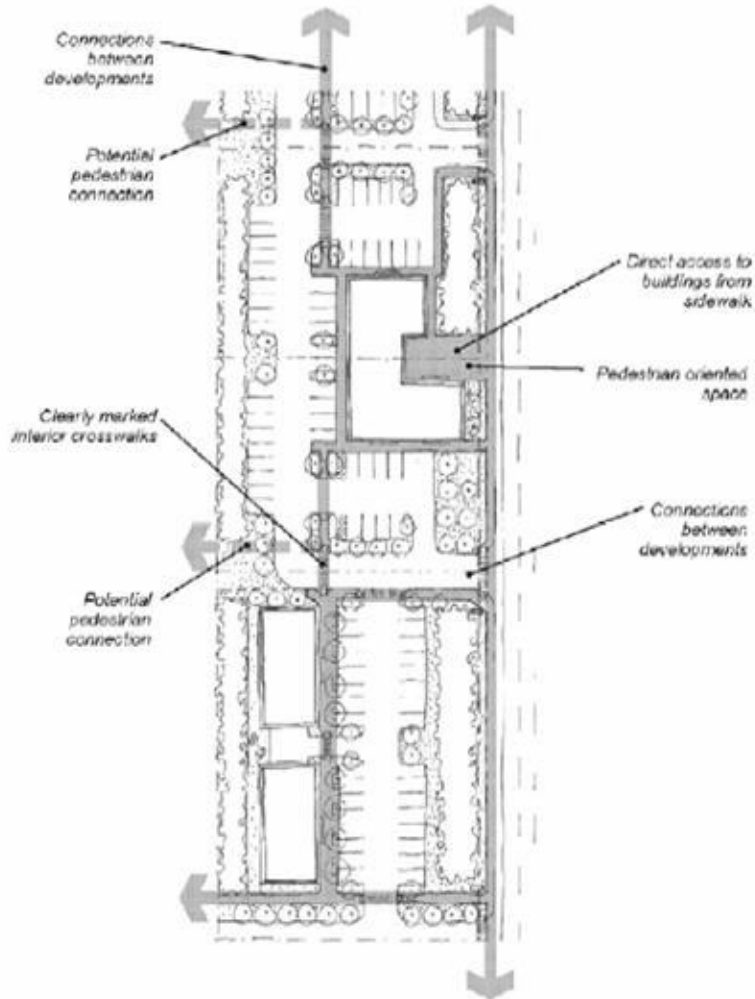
Developments should include a circulation system that connects buildings, open spaces, parking areas, and the adjacent street sidewalk system.
